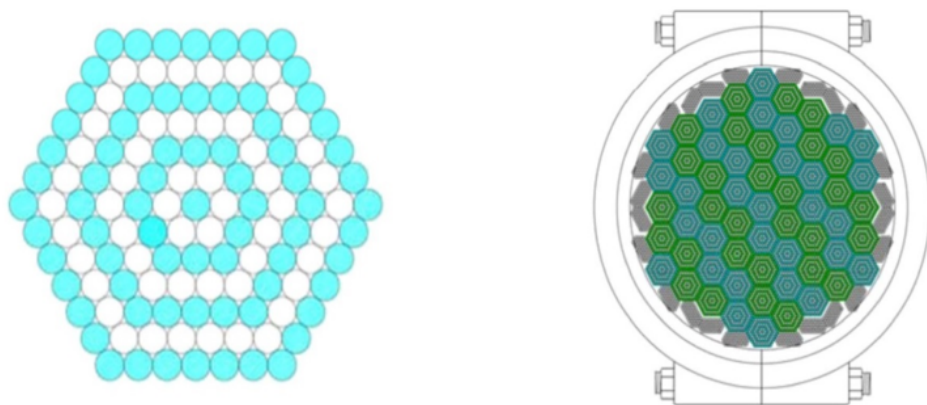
Detail view of a single 127-wire strand (left-hand side), the outline of a Cable Band (right-hand side).
